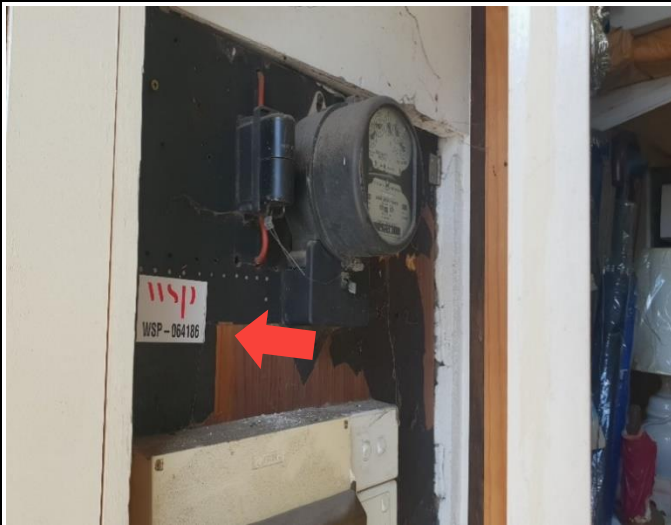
32 Good Street, southern wall, asbestos-containing electrical distribution board.
